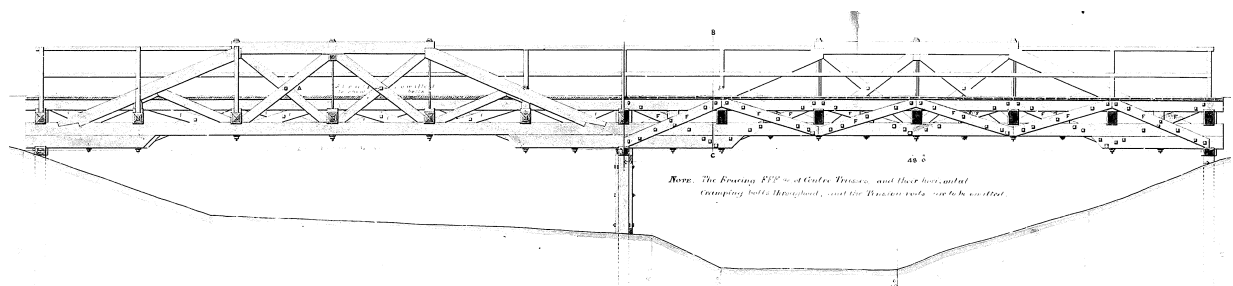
Bennett's Rope's Creek Bridge, 1860 (48' Spans)
